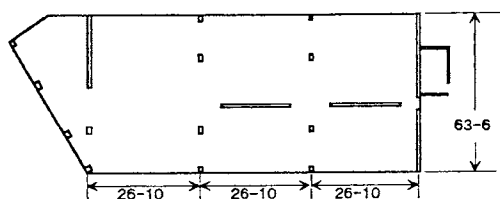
Floor Plan of Tower I of Airport Plaza Hotel
